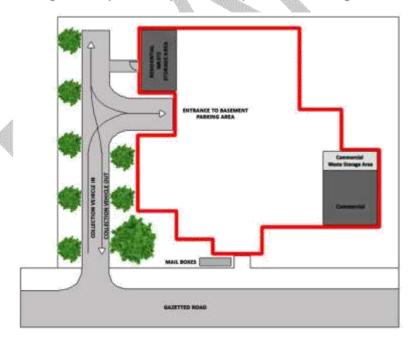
Example of an acceptable on-site (off-street) Waste Storage Area
